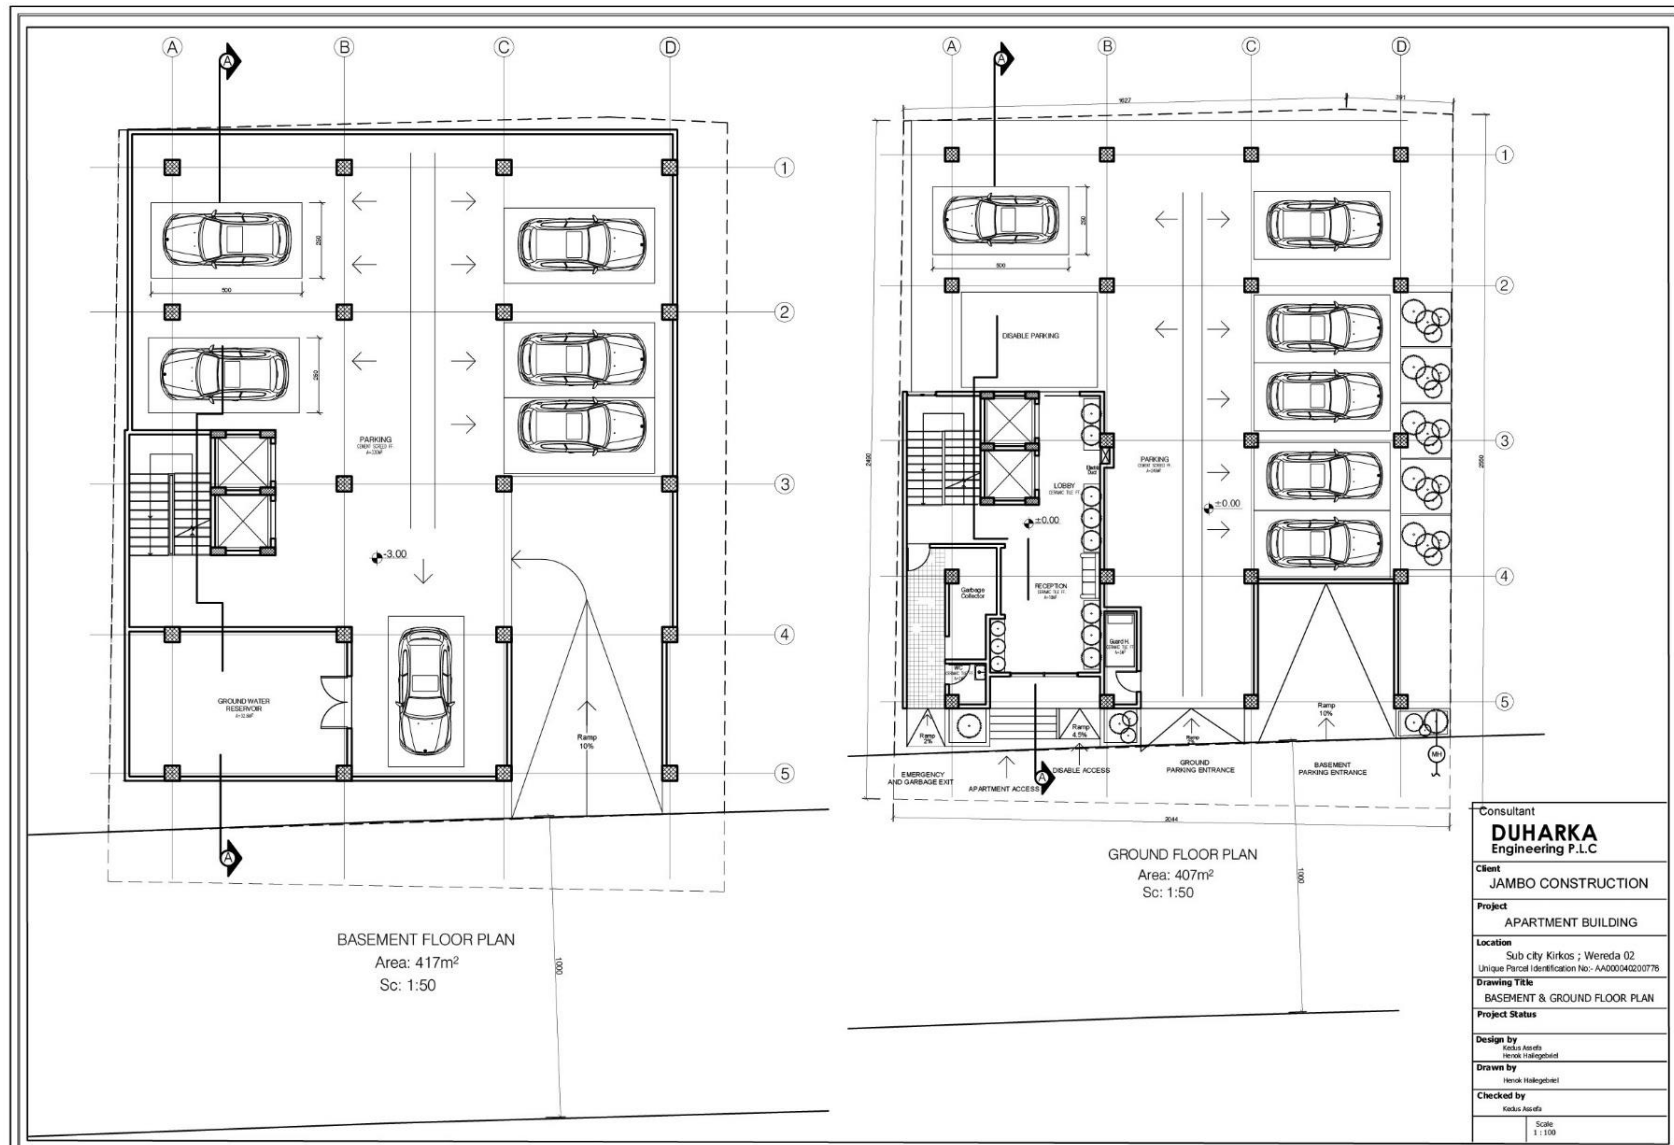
Basement and Ground floor plan for Global 6 (source: Jambo real-estate)
